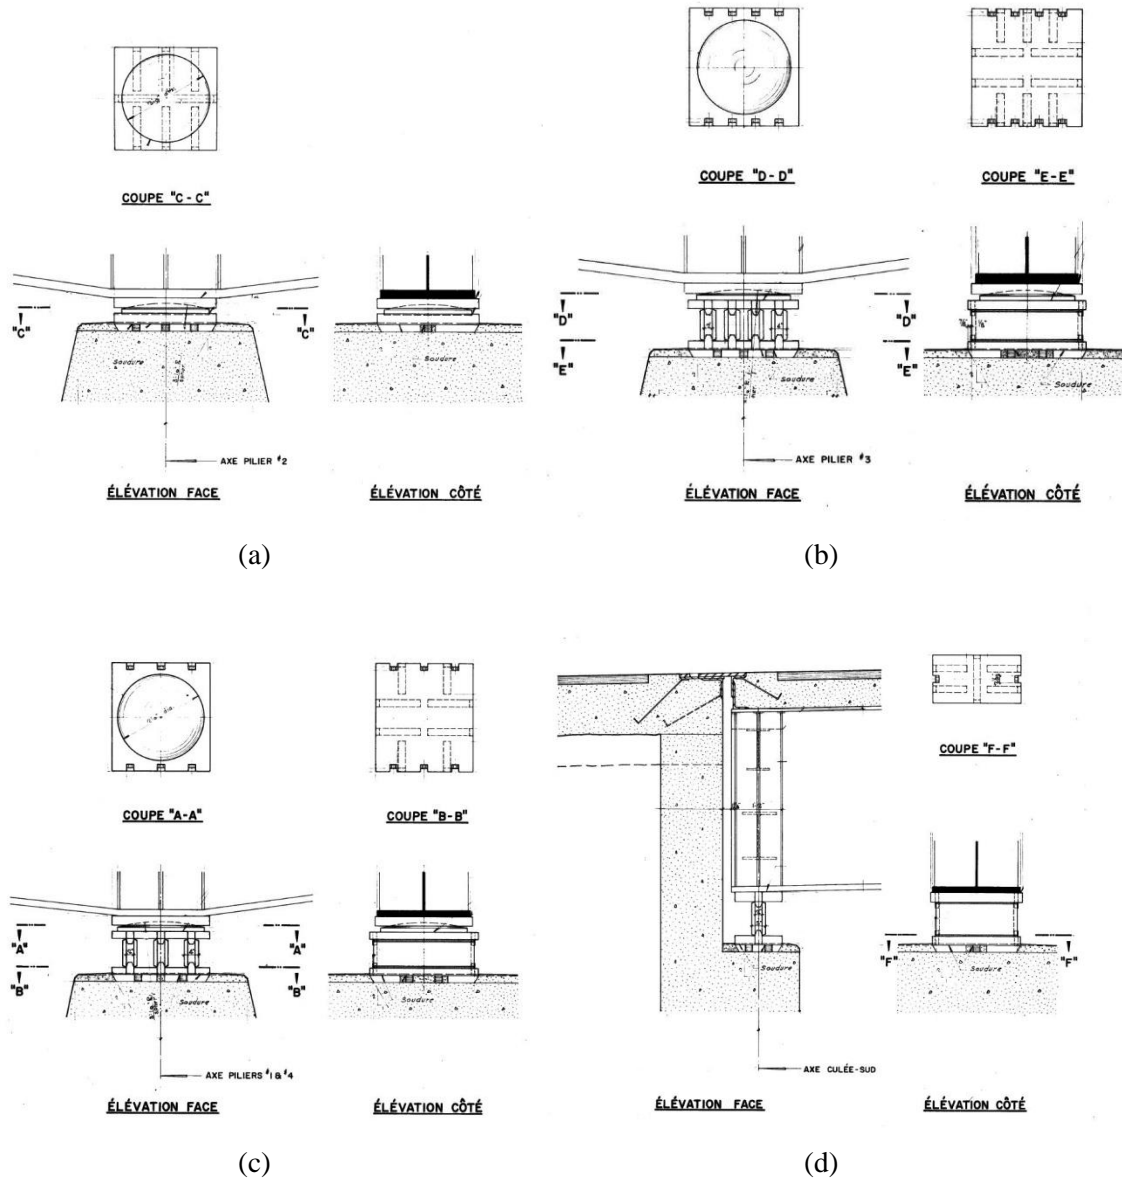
As-built plans of the bearings a) low-type fixed bearing b) High-type expansion bearing (I) c) High-type expansion bearing (II) d) high-type expansion bearing (at the abutments)
